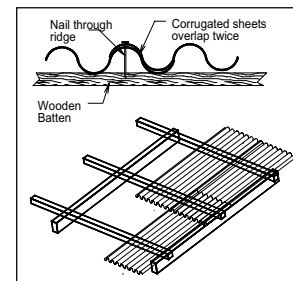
Suggested techniques for assembly of corrugated steel roof
